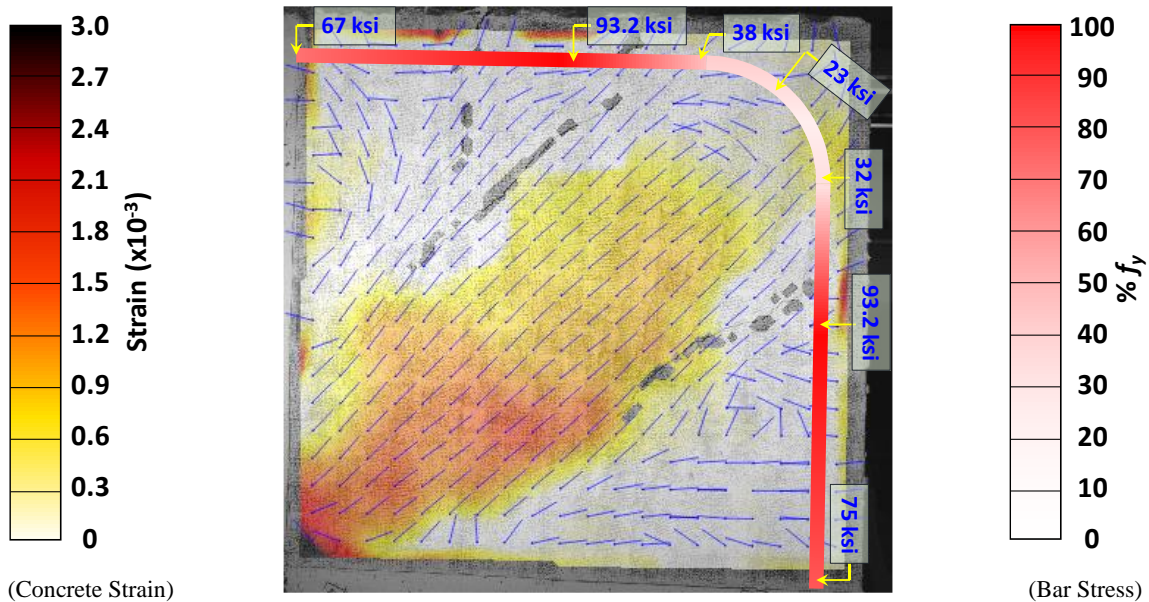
Bar stress distribution and concrete strain in the joint of Specimen A-R9-45
